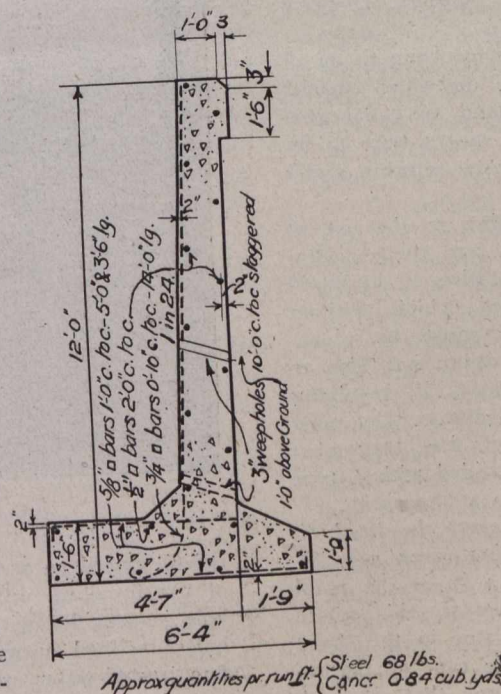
Typical Section of Retaining Wall at Intermediate Point.
